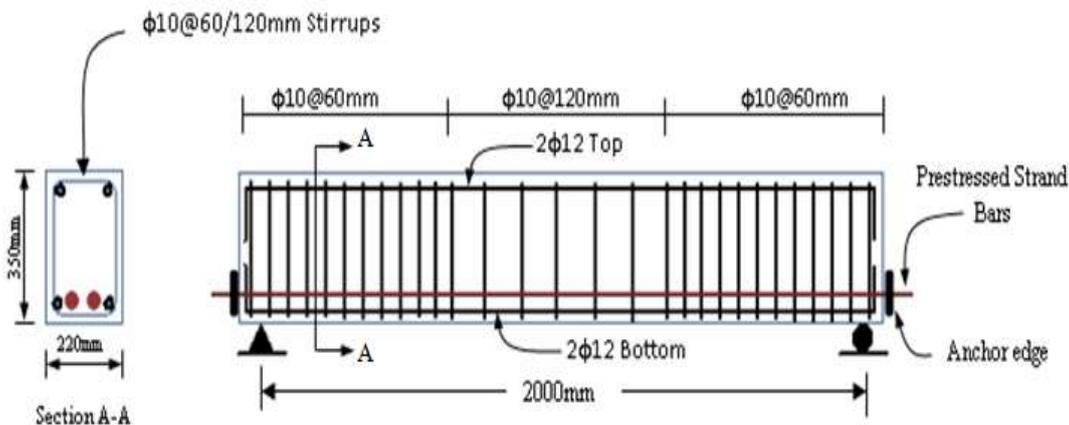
Reinforcement Details and Dimensions of the Tested Beams
